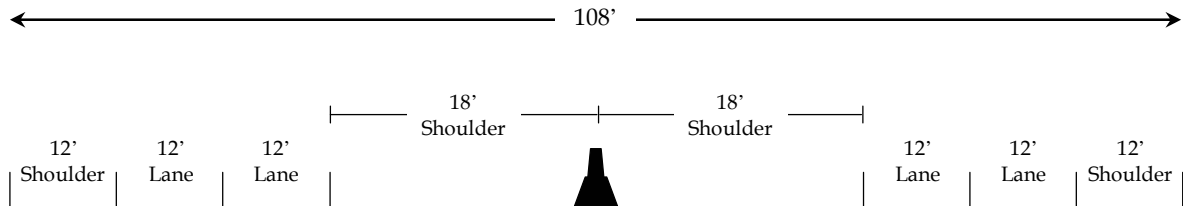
Proposed Eight-Lane Typical Paved Section
